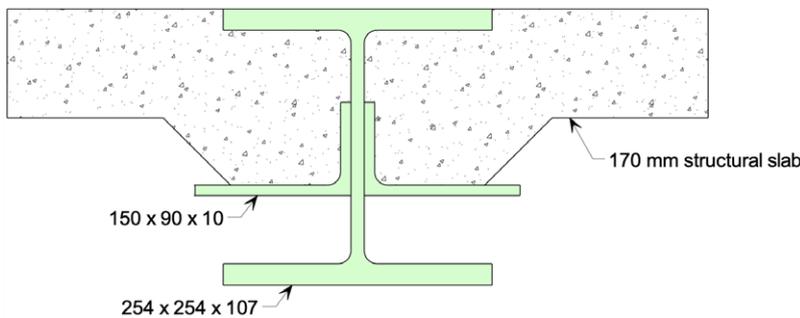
Cross-section through a 254 x 254 UC beam and 150 x 90 shelf angles supporting a composite slab with decking supplied with crushed ends
